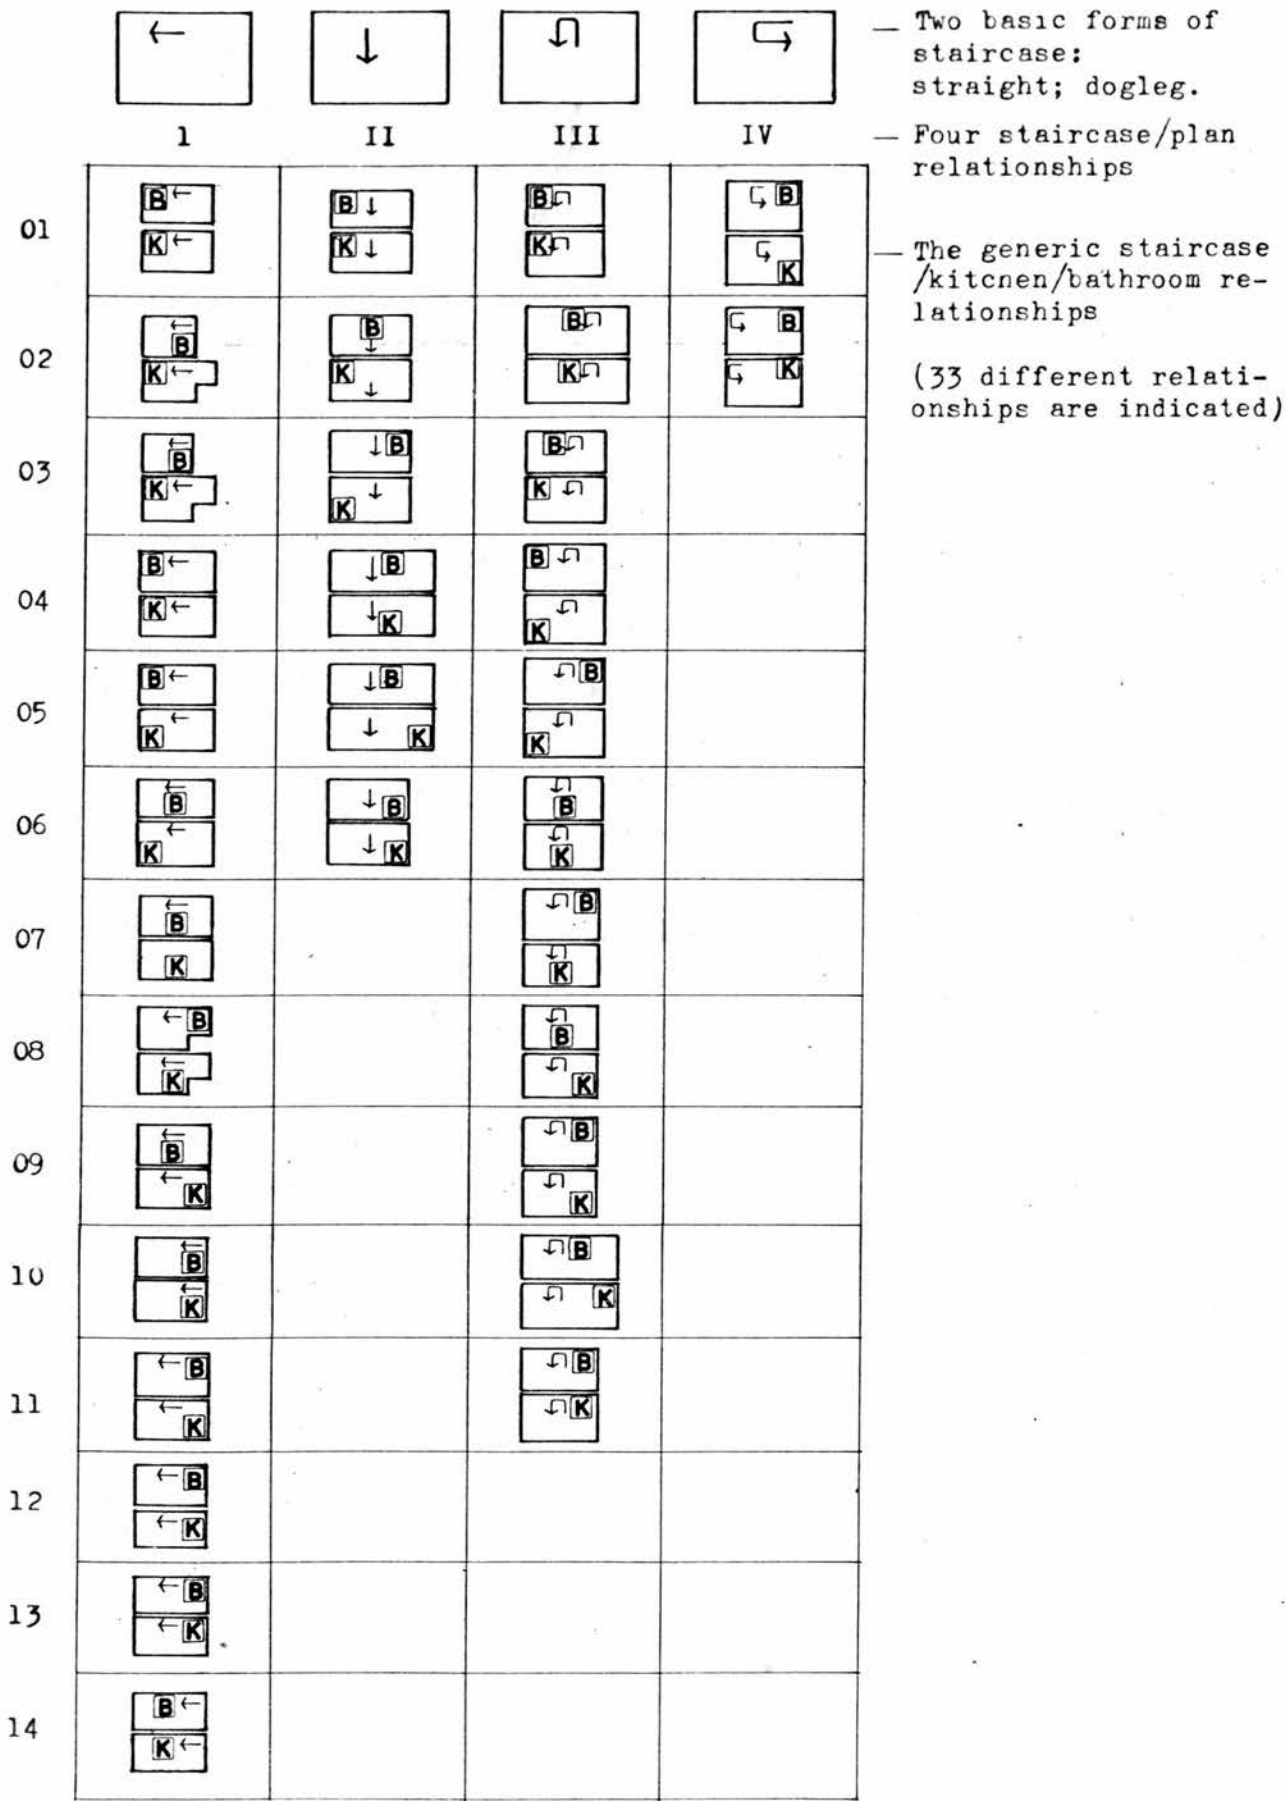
Generic Plan Chart (NBA 1968)
